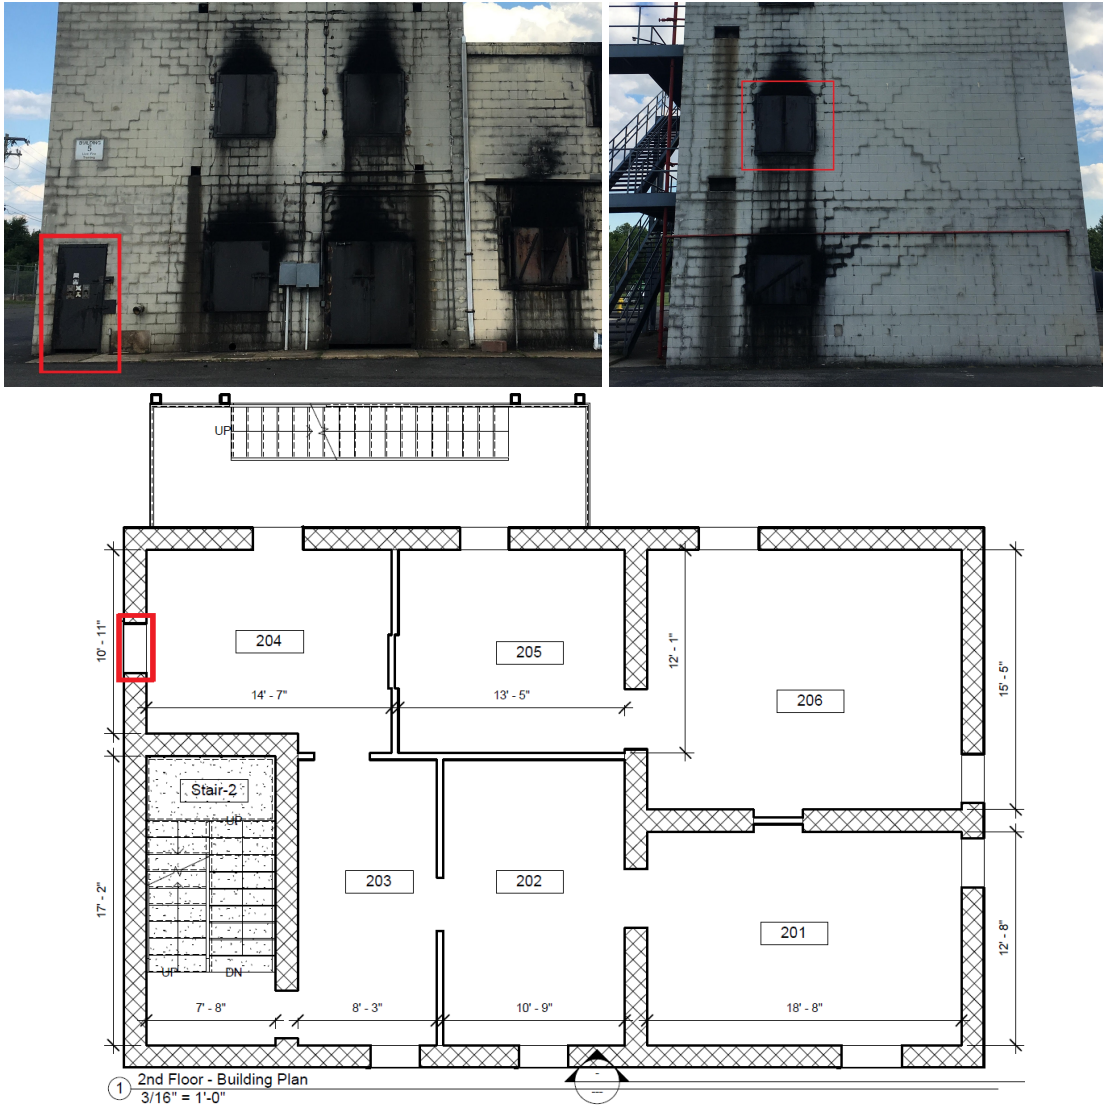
Far Ventilation Case. Red box on floor plan denotes the window to Room 204. The exterior door on the front of the structure, at ground level, was also opened in the remote vent case.
